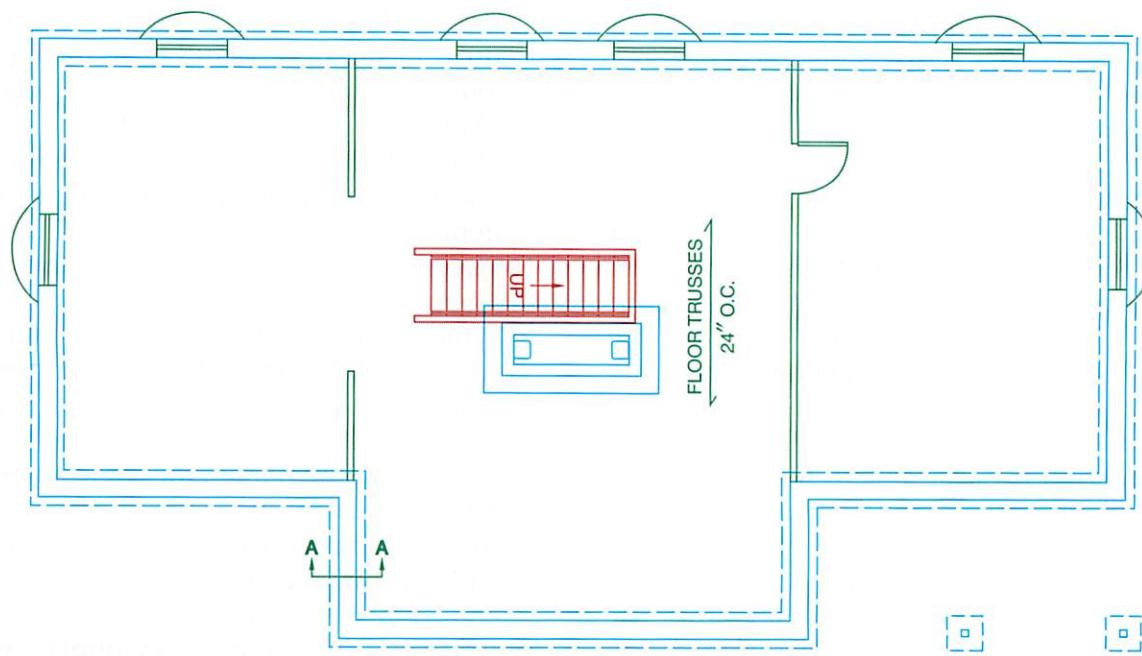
The floor plan layer has been turned off and interior walls, stairs, windows, and doors in the basement are added.
